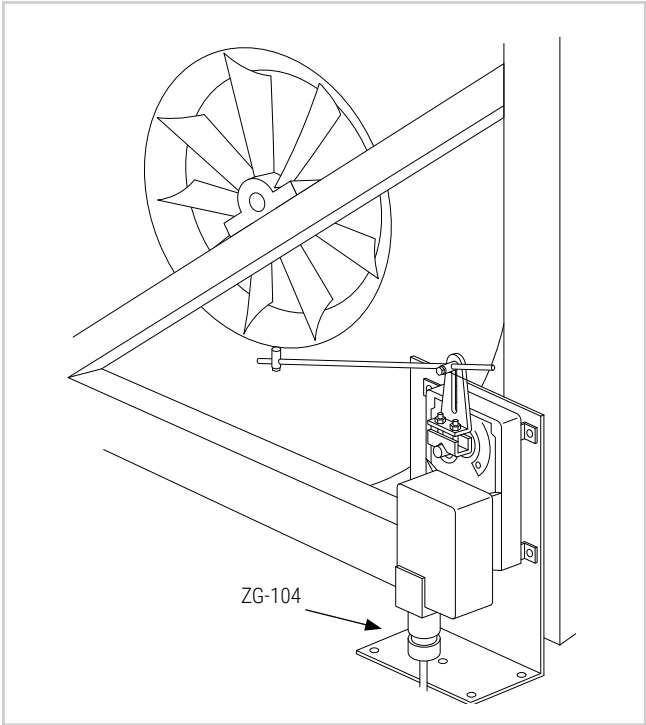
Actuator is mounted to the ZG-104 universal mounting bracket or to a field fabricated bracket and connected to the inlet vanes with a crank arm kit
